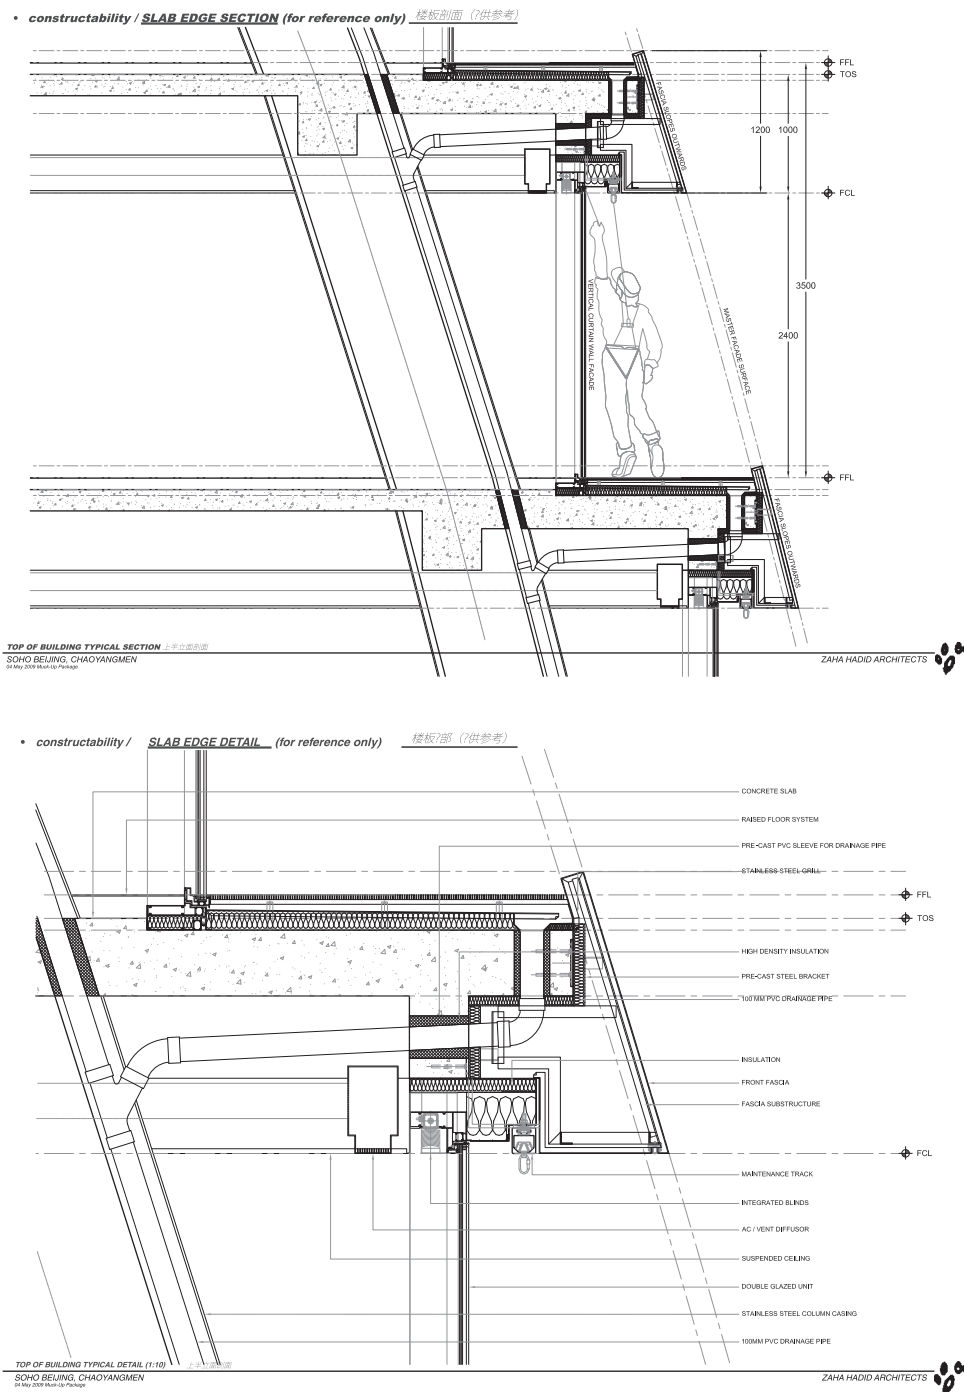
Façade construction: Detail section through the façade of the SOHO Galaxy project in Beijing showing fascia and glazing system with concrete structure. (Reproduced by permission of Zaha Hadid Architects.)
